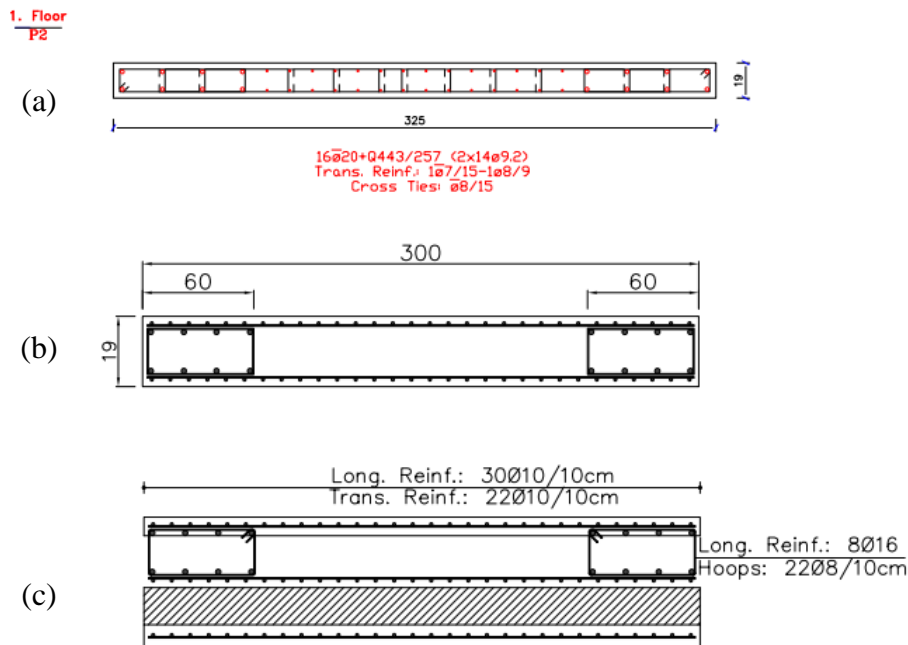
"P2" Double Wall Conversion; (a) Monolithic Wall, (b) Structural Part of Equivalent Double Wall, (c) Equivalent Double Wall
